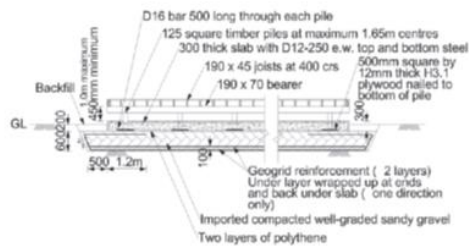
Type 3A surface structure - Detail at supporting blocks
